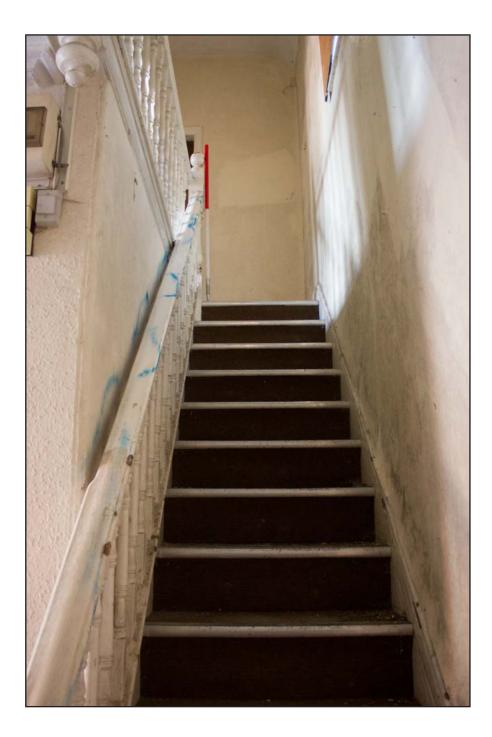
Stairwell within Superintendant's building at the Miner's Rescue Center,
